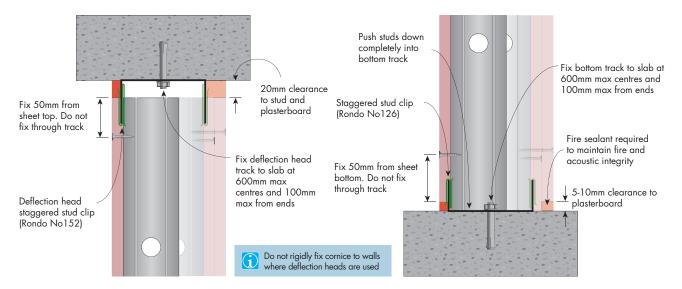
Staggered Stud Wall Deflection Head Non-load bearing wall FIGURE 30 Staggered Stud Wall Base to Slab Non-load bearing wall
